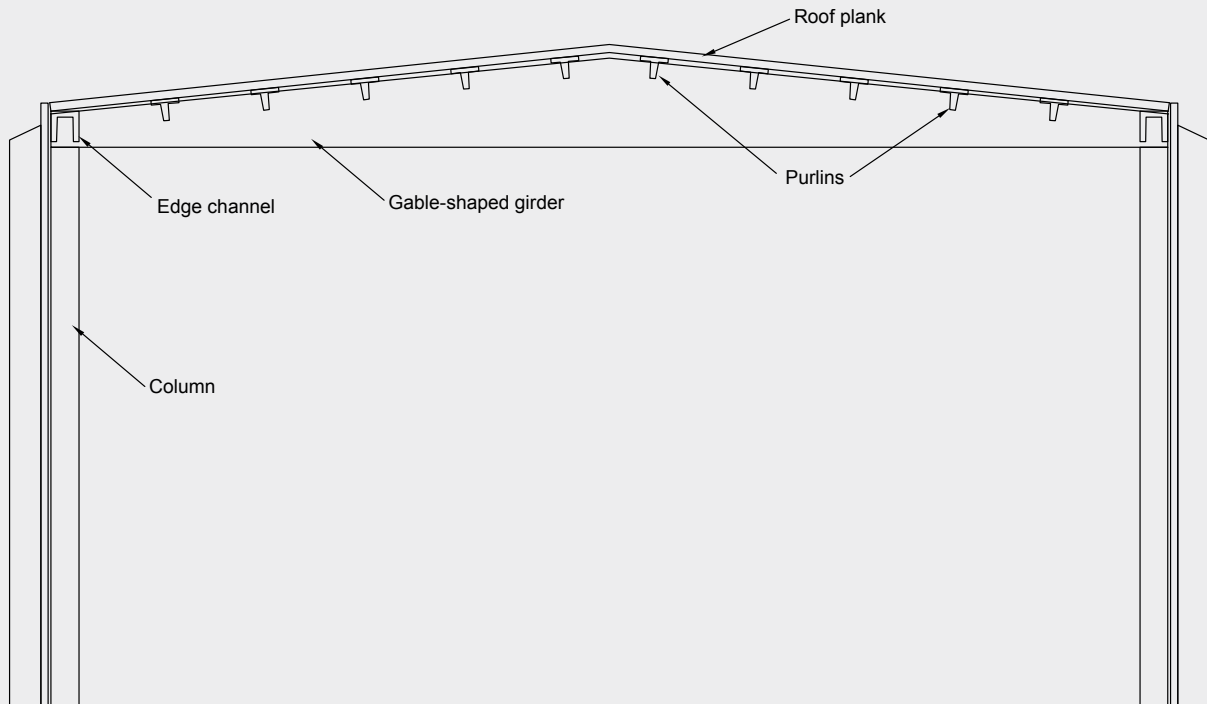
Framing system that uses long-span gable beams on columns and is clad with double-tee walls in an industrial building with offices.
